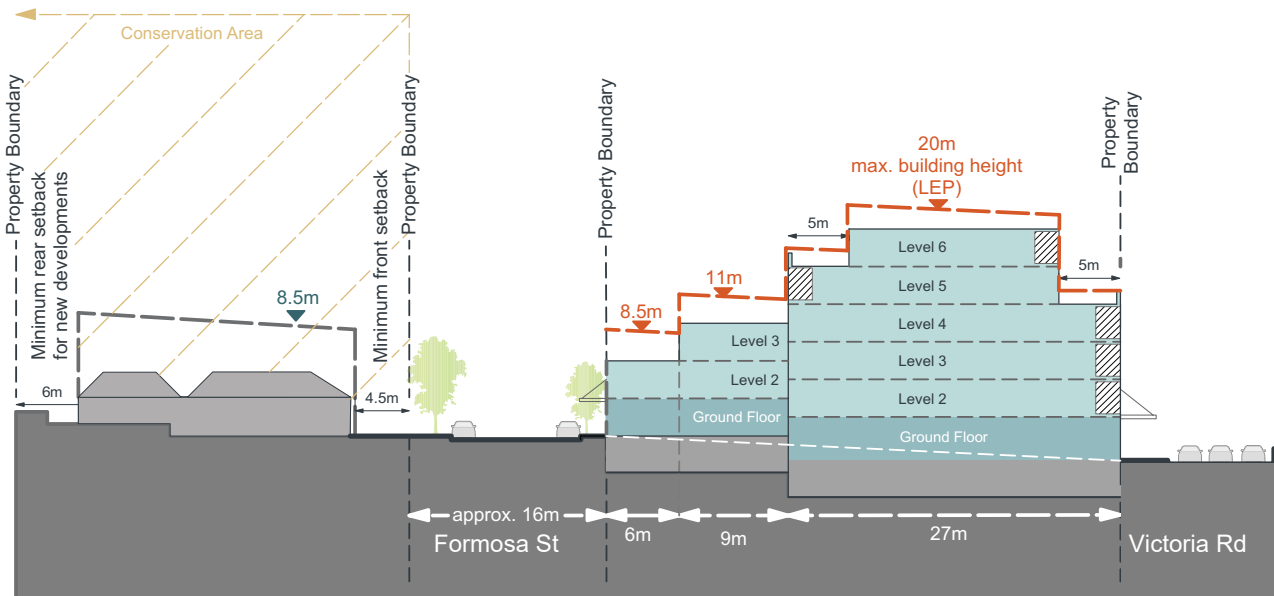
Sectional view showing proposed LEP and DCP maximum building height controls on the western side of Victoria Road
